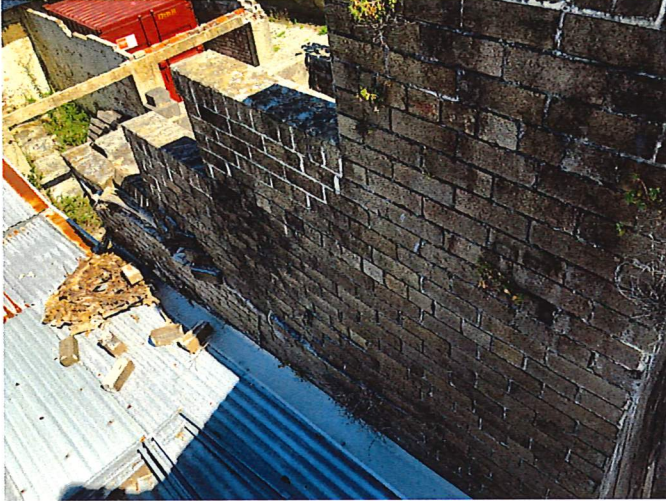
Note the debris from the crumbling stair balustrade on the roof of the adjacent property
